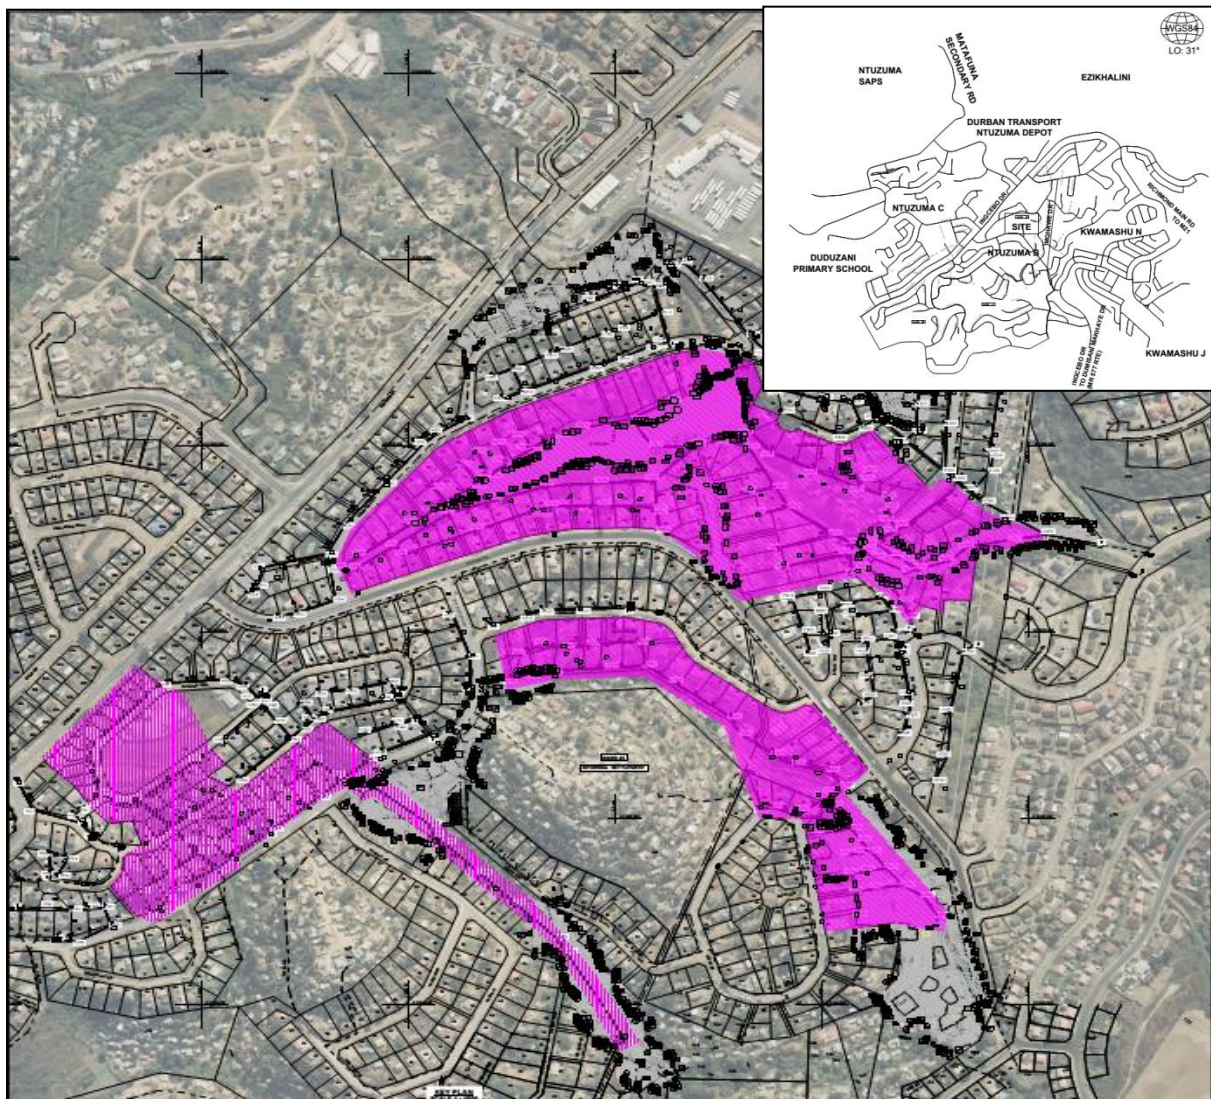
Master layout plan of the upgrade activities proposed for Kwamashu North (Ncumatha Trading and Projects, 2019).
